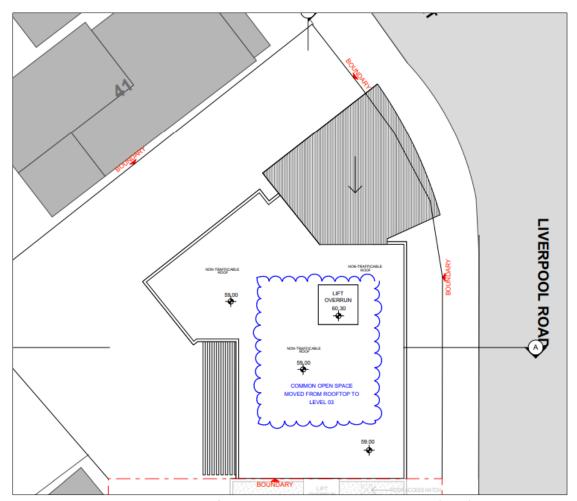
Roof plan. Source: Source: Ghazi Al Architect (2024).
